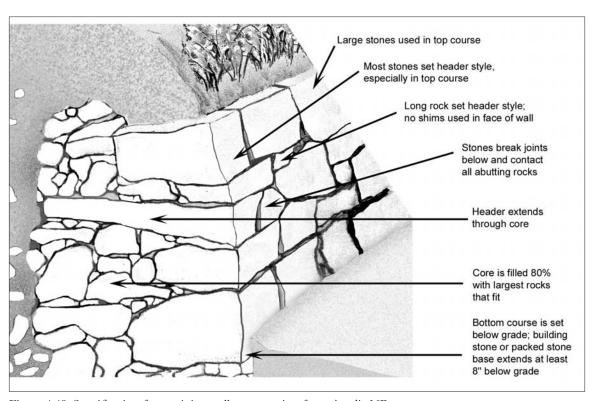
Specification for retaining wall construction from Acadia NP.
